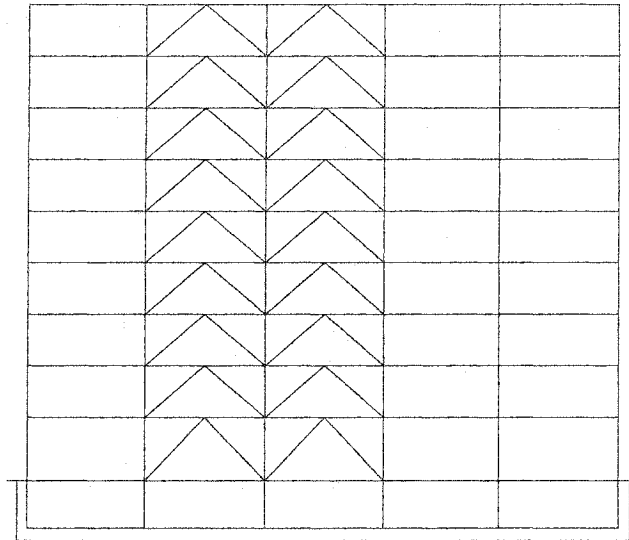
Elevation of Conventionally Strengthened 9-Story Building Using A Brace System
